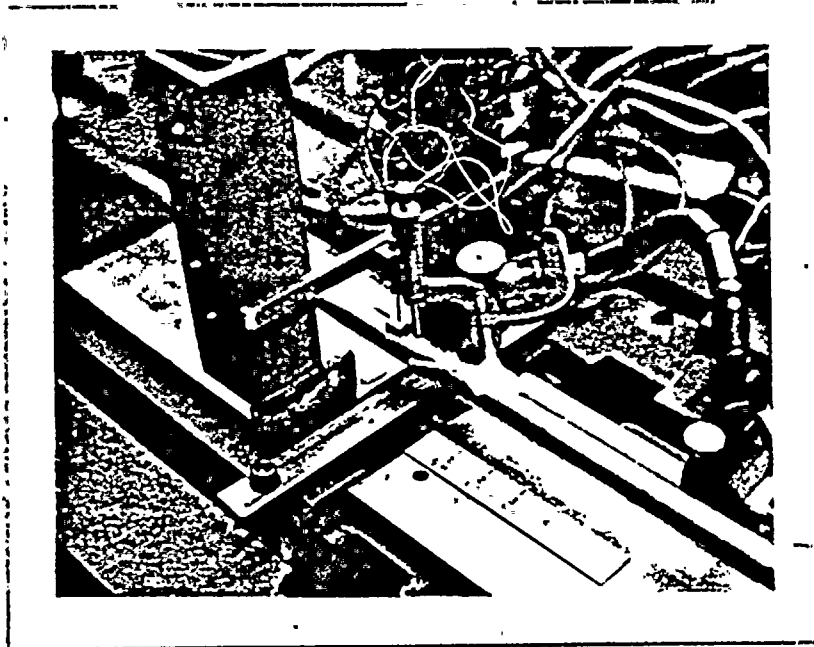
CLOSE VIEW OF FATIGUE TEST SETUP
